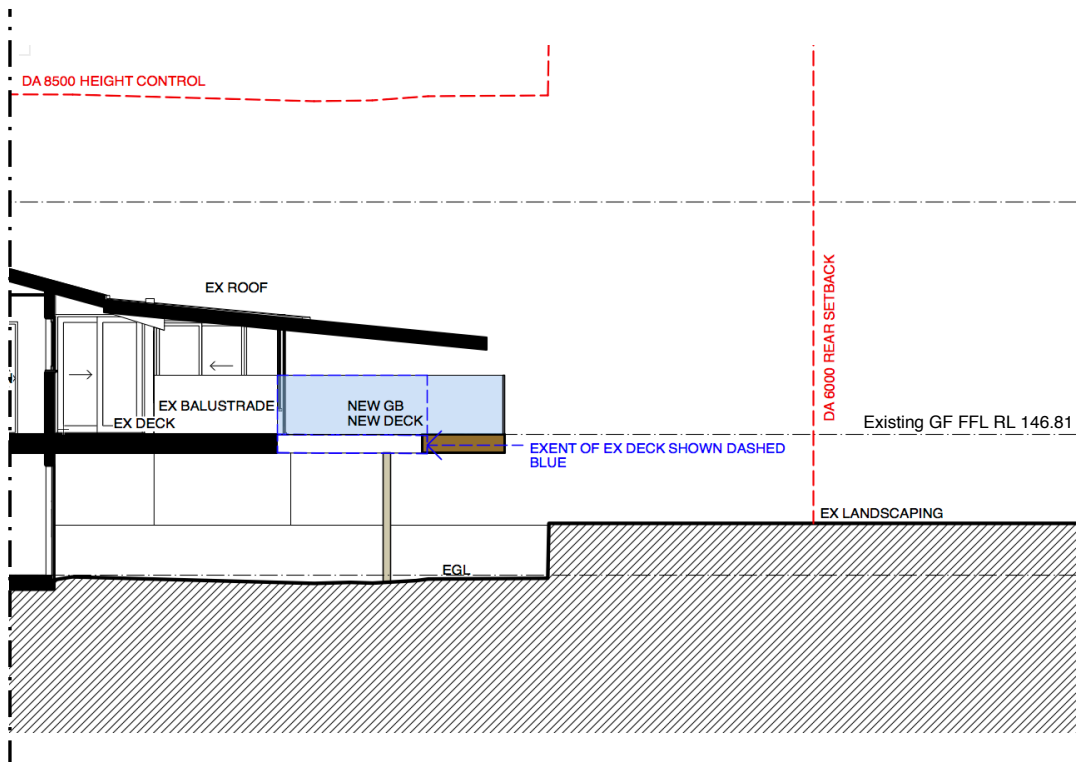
CDC Section CC 11 Jones Street, Beacon Hill
